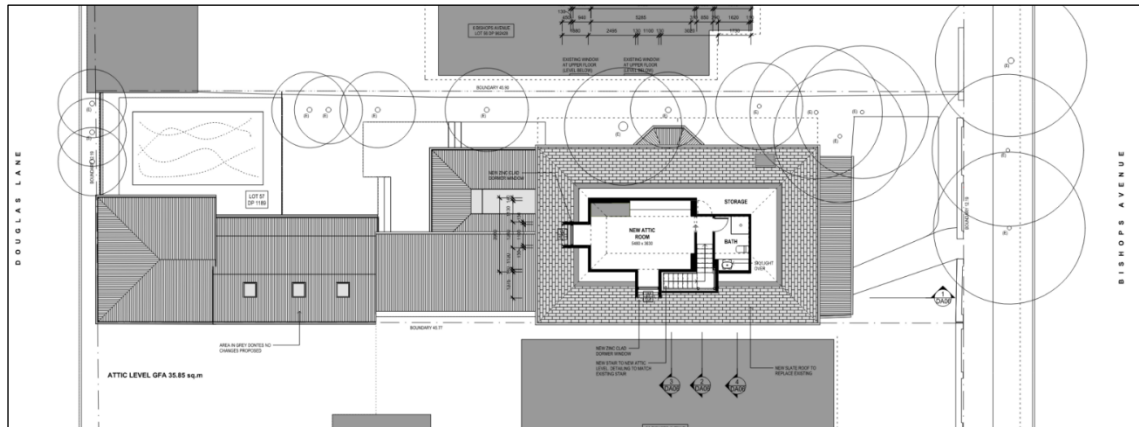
Extracted from Attic Level Plan (Source: Source Architects Pty Ltd)
